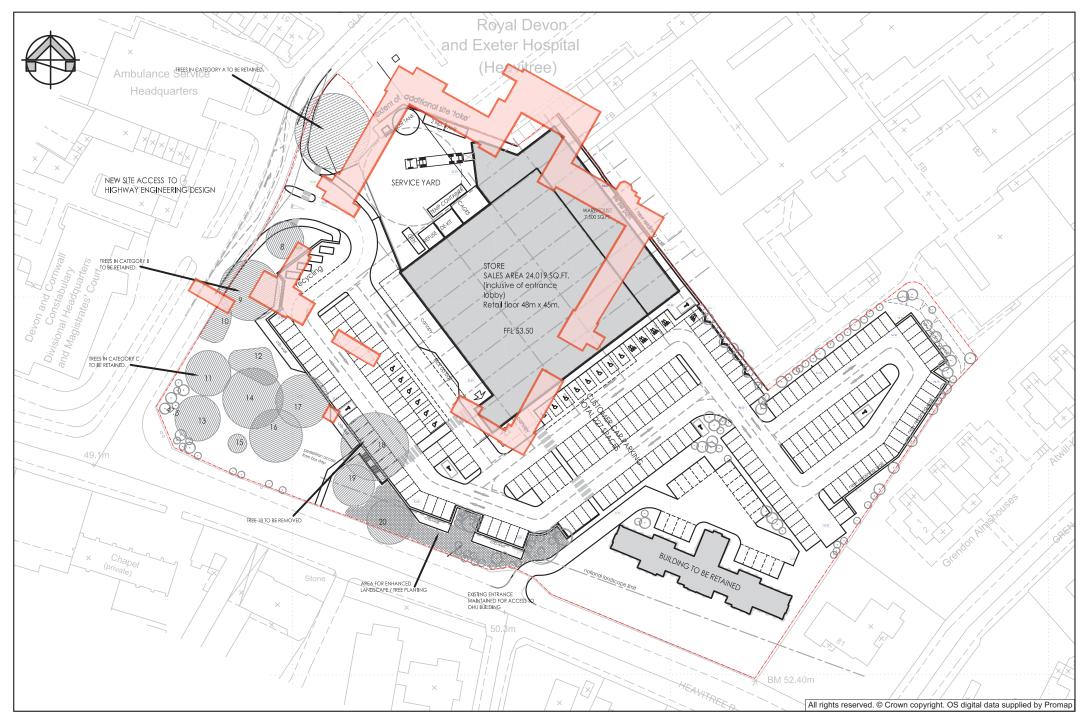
The workhouse buildings present within the site in 1876 in relation to the proposed development. Scale 1:1000.
